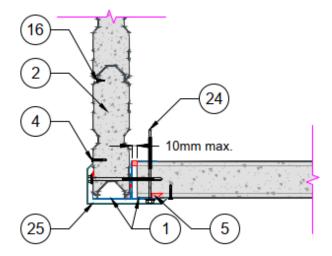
Vertical or horizontal Speedpanel wall under stair stringer (section view)
